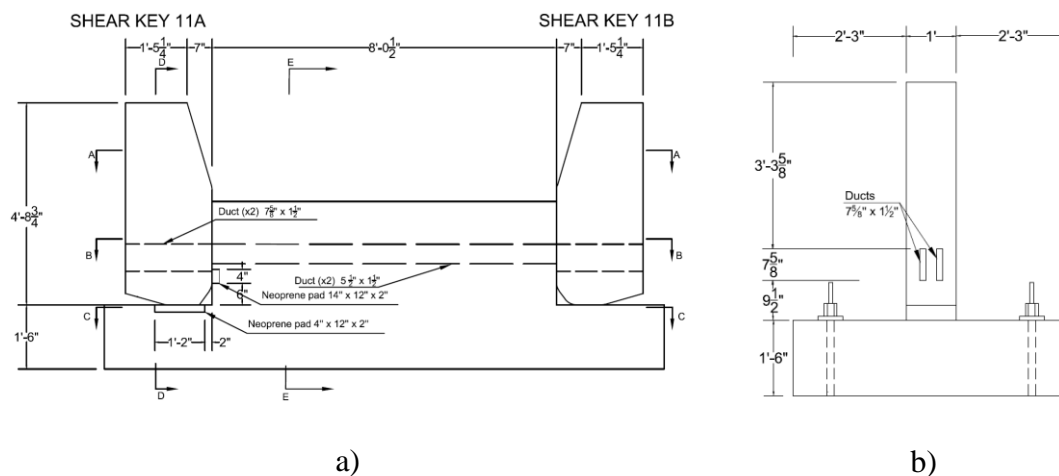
Neoprene pads and steel ducts in Specimen 11: a) elevation view; b) side view
